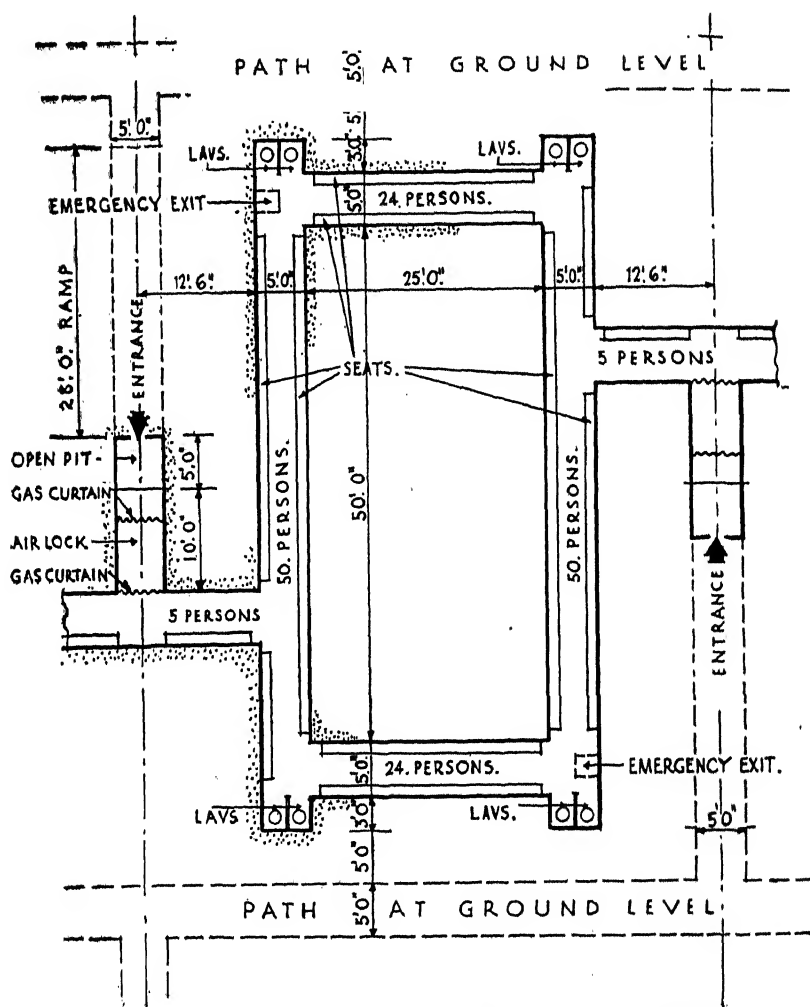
Section of block trench planning giving accommodation for 1,200 persons to the acre.
